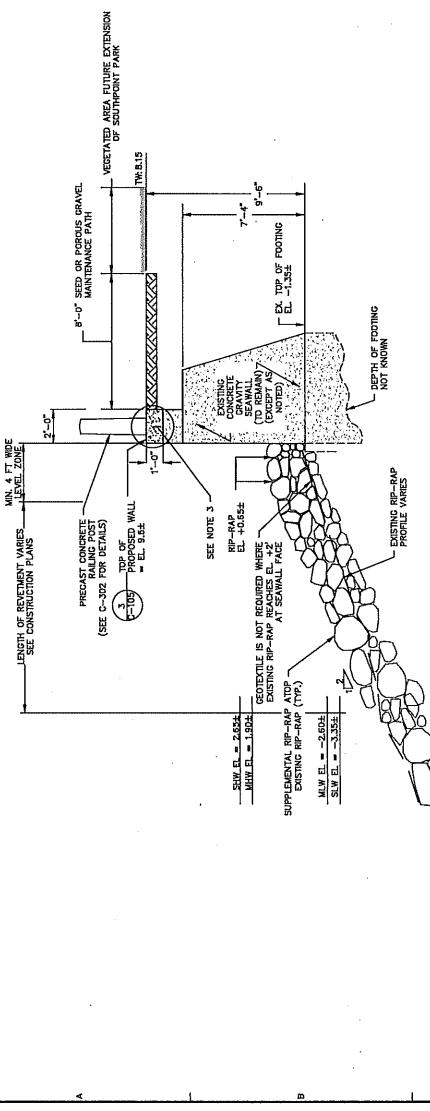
DETAILS OF RETROFIT TO EXISTING WEST-SIDE CONCRETE BLOCK WALL
